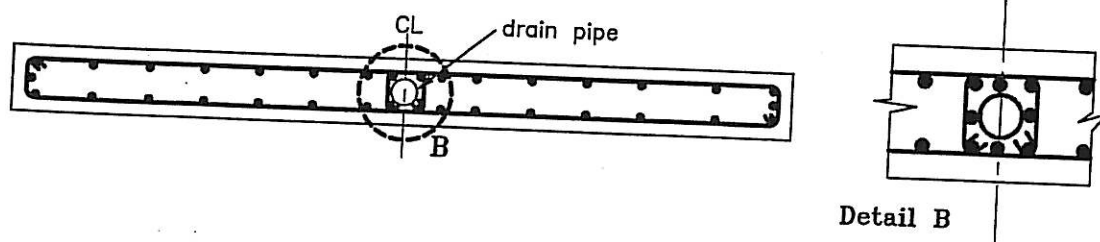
Plan view of RC wall showing the drain pipe positioned at the centre of the section of wall
